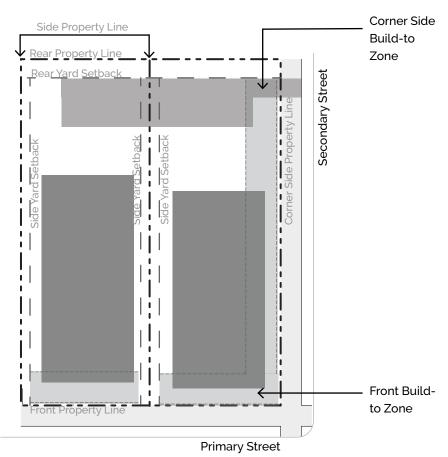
Build-to Zone, Property Lines, & Yards.
